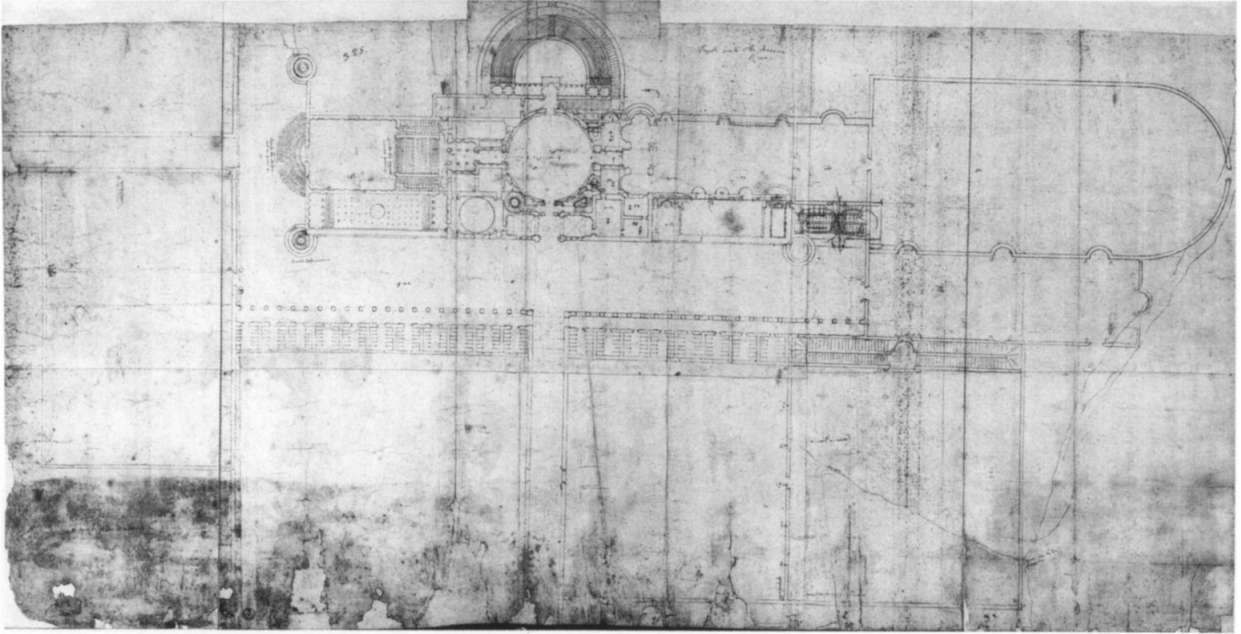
Plan of Villa Madama<sup>25</sup>
